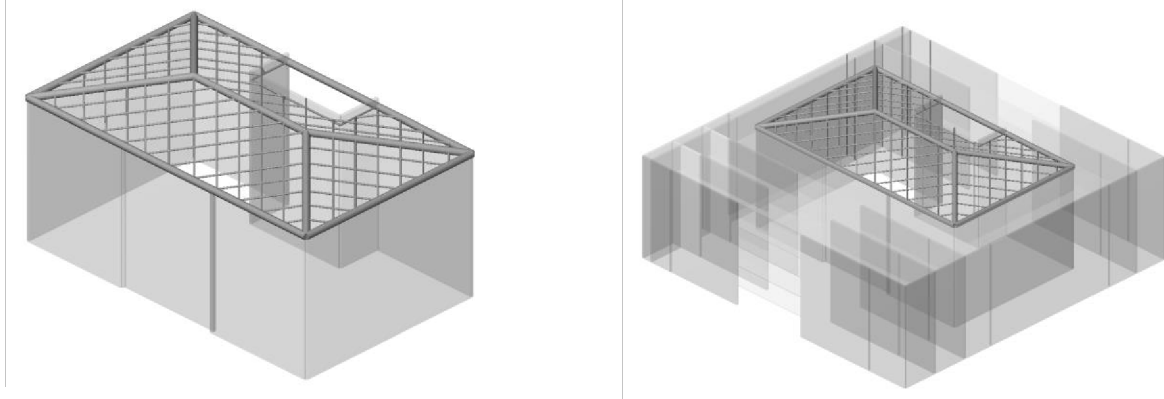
Tower 7 3d model - Static model of roof structure with and without main building's walls. To accurately model, analyse, render, and ultimately construct the roof structure, geometric parameters needed to be established that resemble the roof form
